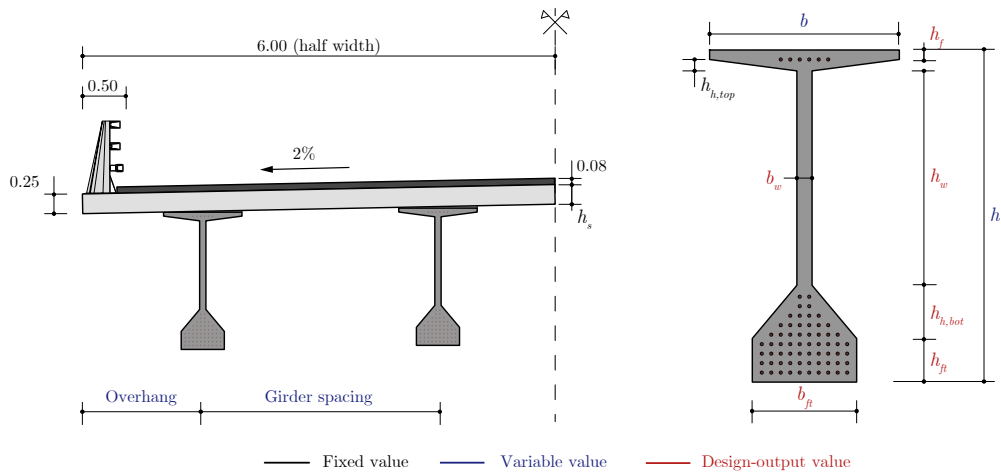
Cross-section of a bridge under study indicating the dimensions.
